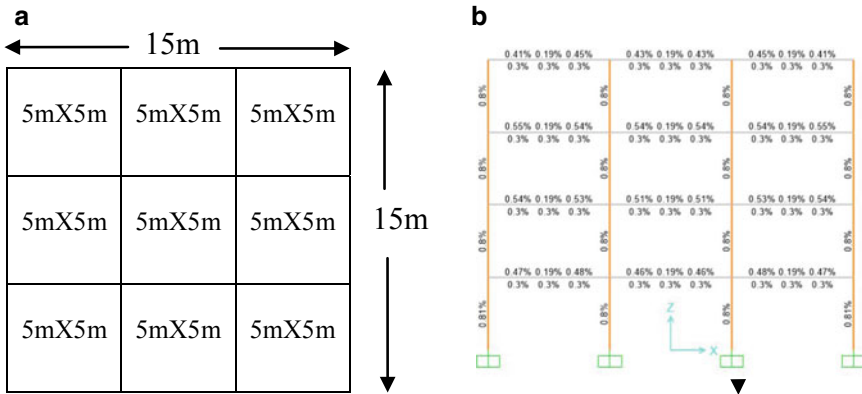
a Plan of model; b Elevation of 4-storey type 2 building showing percentage reinforcement in beams and columns
